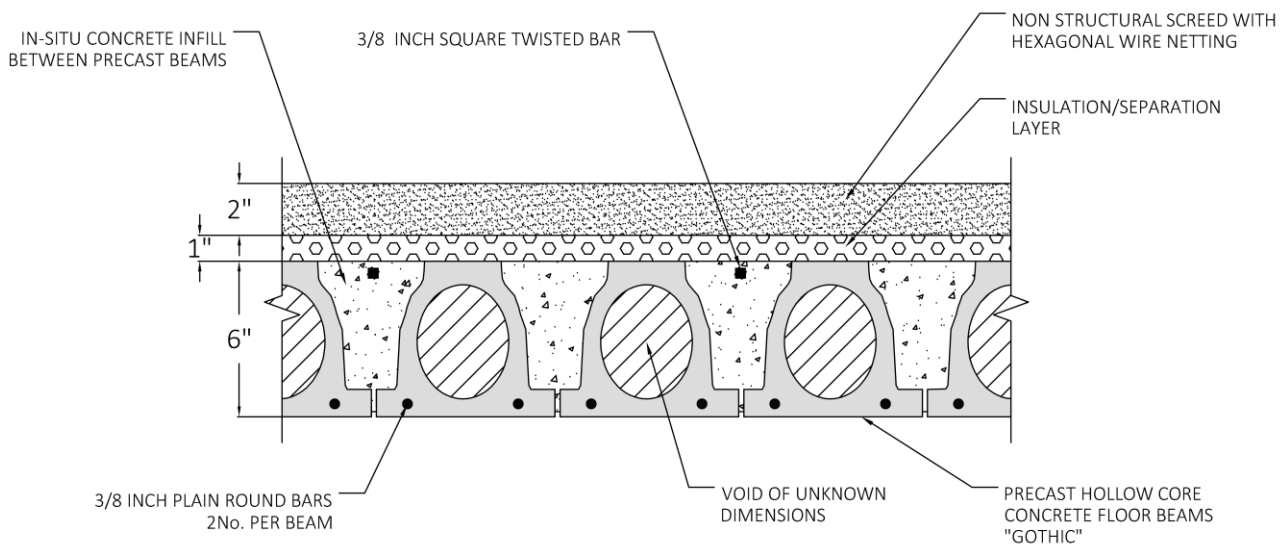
Representation of existing precast concrete slab makeup at tie locations
